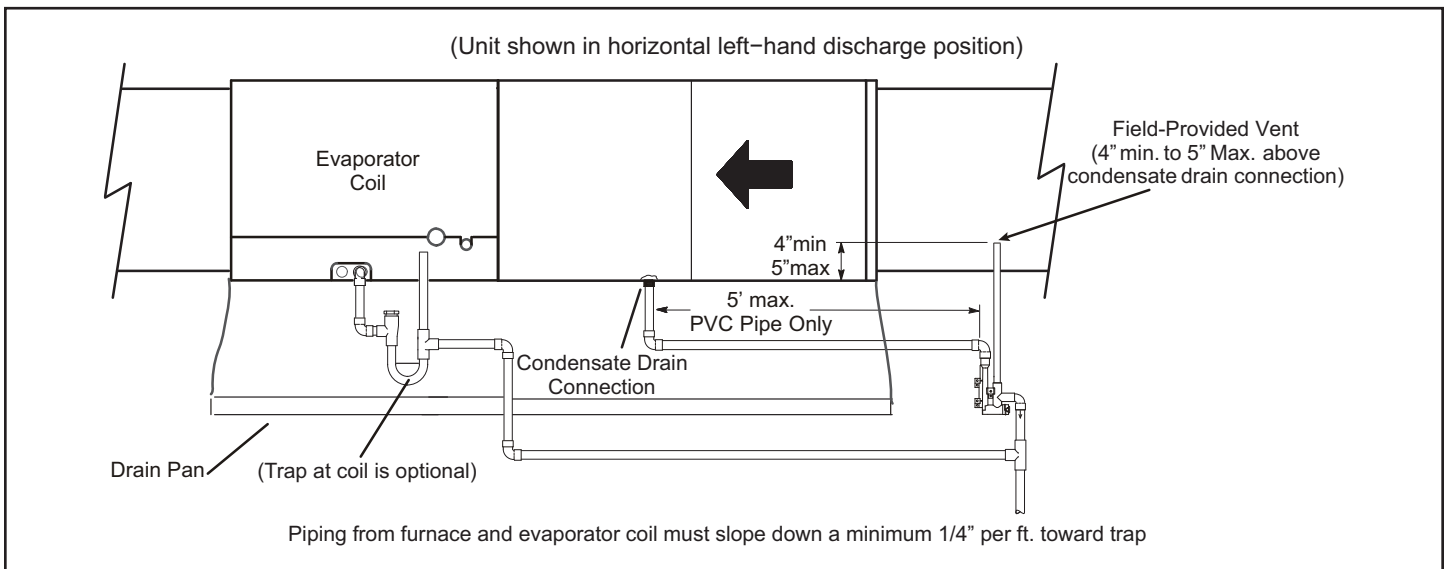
Furnace with Evaporator Coil Using a Common Drain
